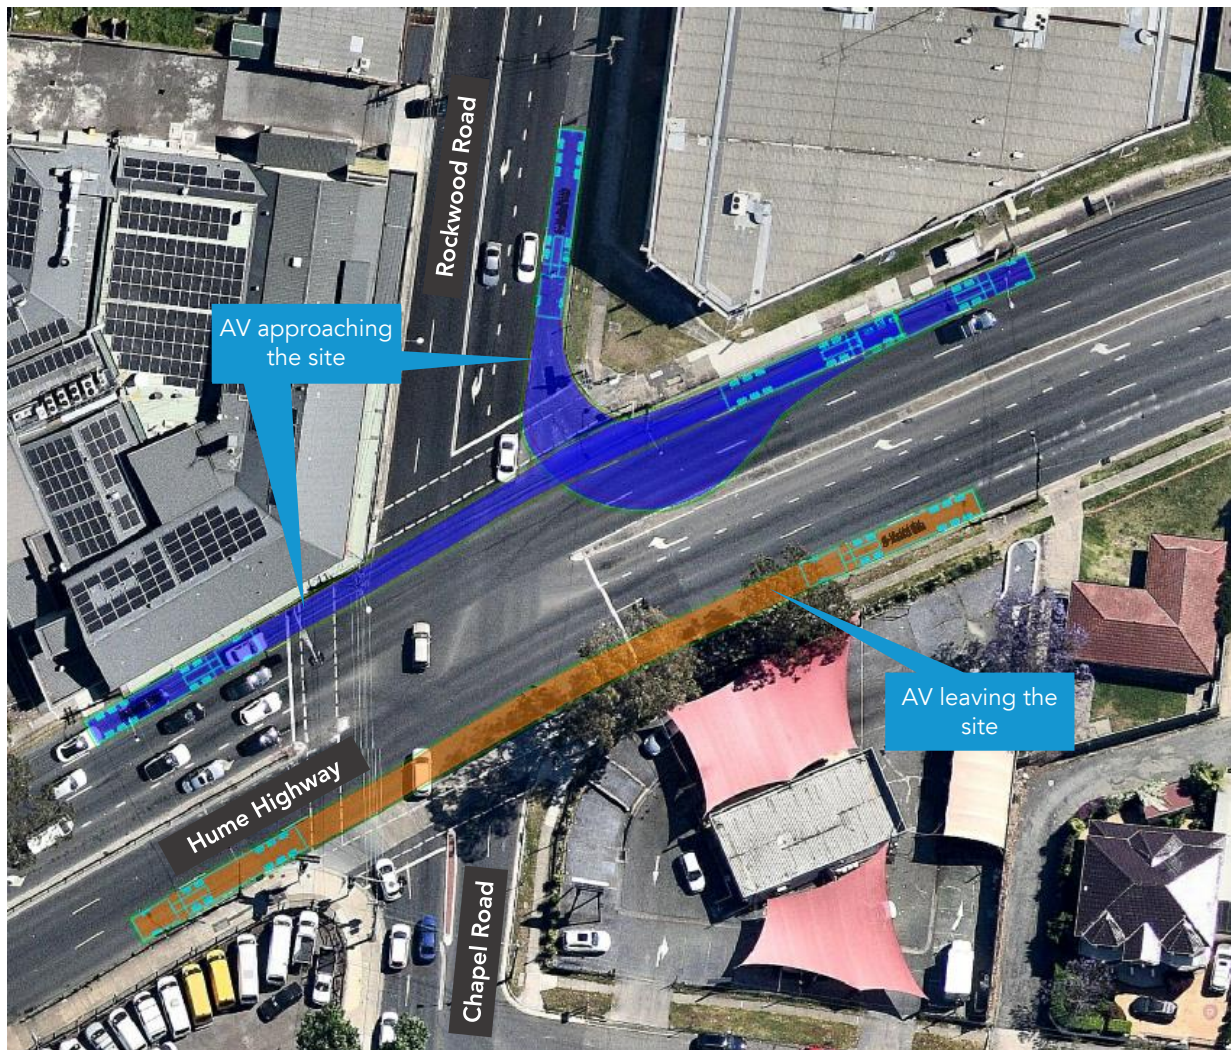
AV approaching the site from North via Rookwood Road, and from West via Hume Highway and leaving the site towards west via Hume Highway
